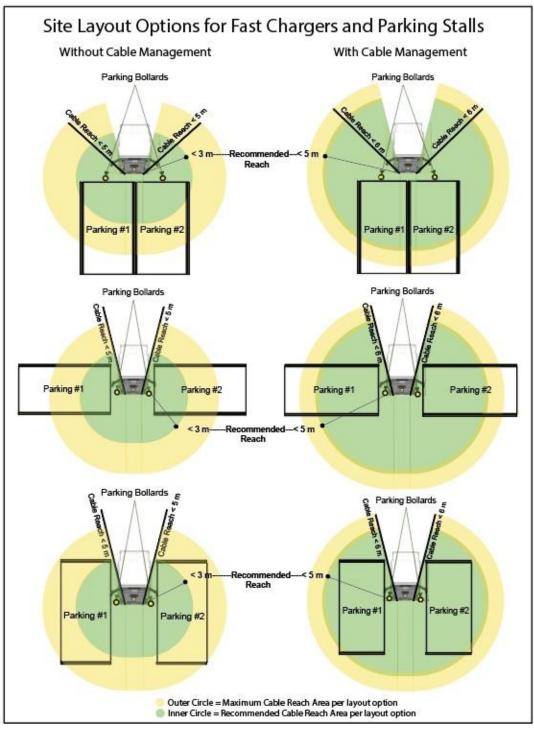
Layout options for Fast Charger's Parking Stalls showing Cable Reach areas
